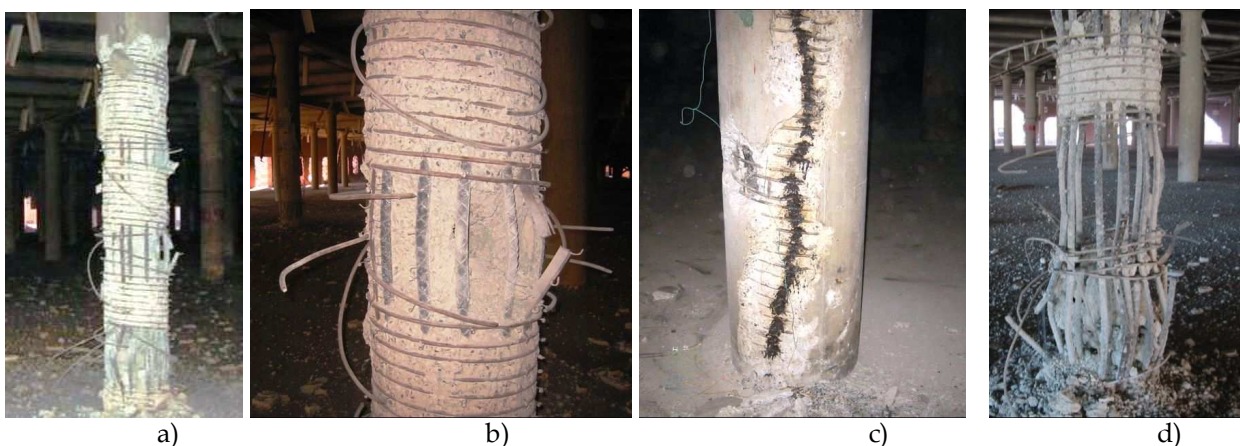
The influence of transversal reinforcement about failure mode of a column: a) și b) the stirrups were not cut ; c) cutting the stirrups; d) increasing the destructive effect (Dykon, 2005)
